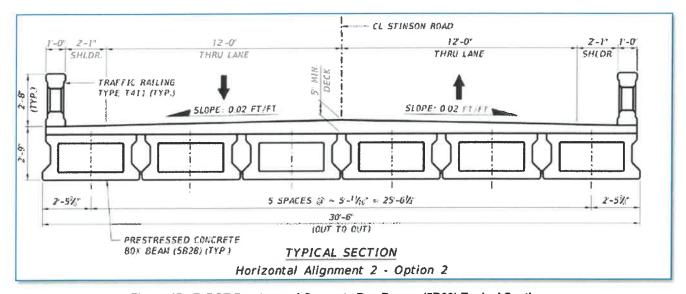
TxDOT Prestressed Concrete Box Beams (5B28) Typical Section
